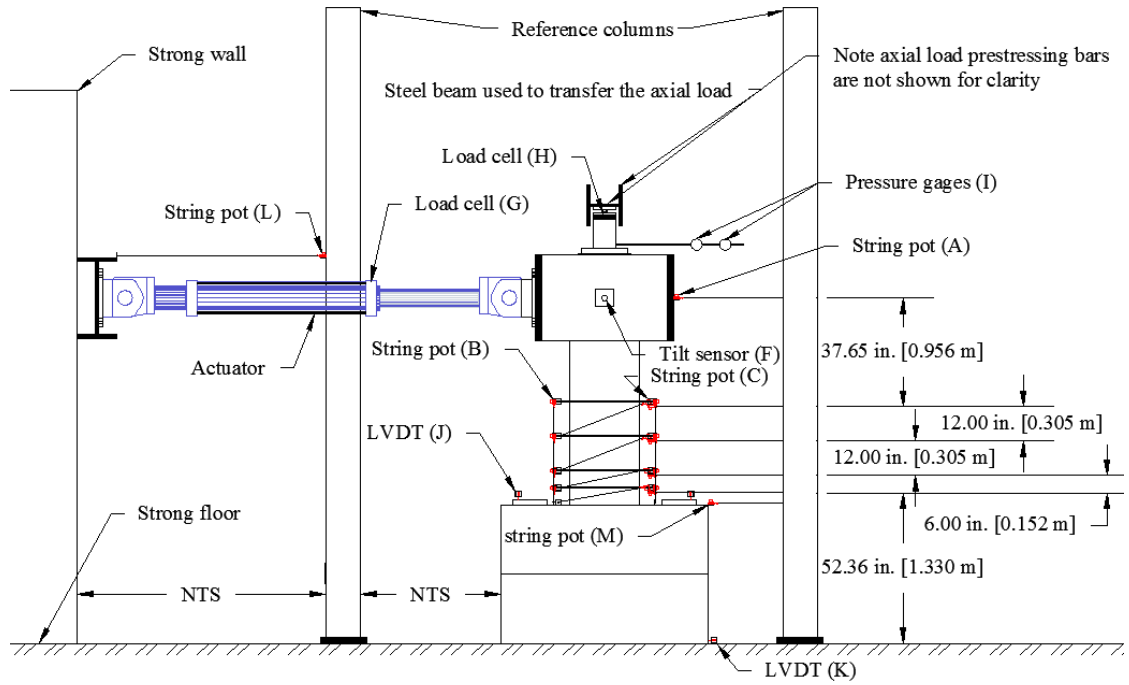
Column G60-s & G80-s external instrumentation (NTS = not to scale)
